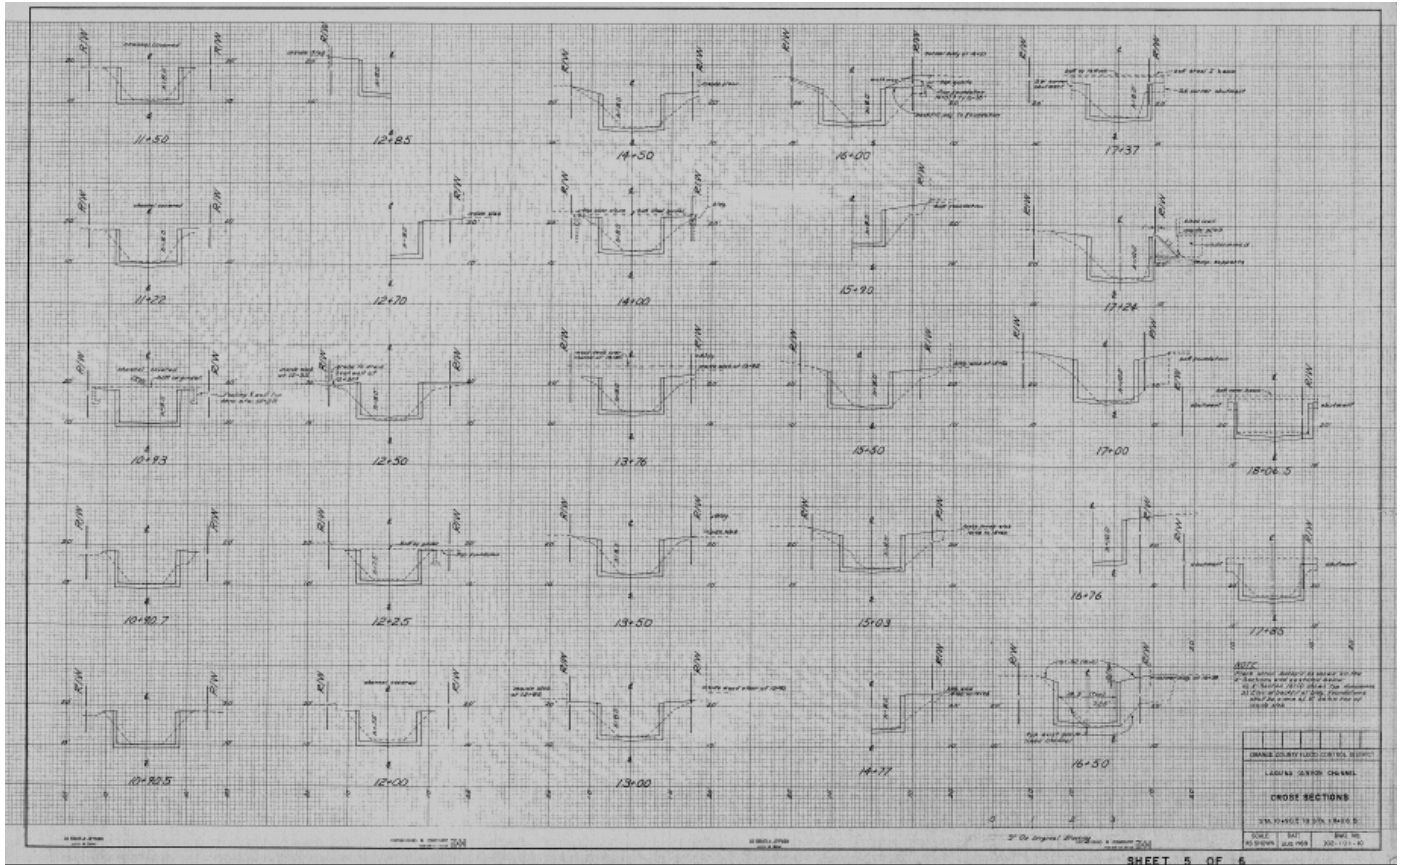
Structural Details 1969 Channel Plan (Sheet 5 of 6)
